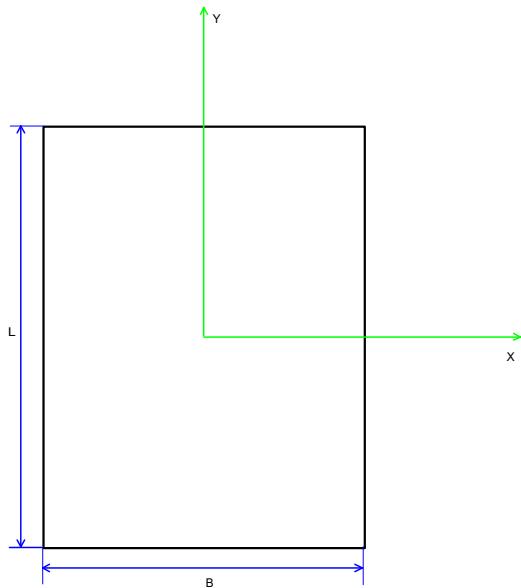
Notation for Rectangular Loaded Area Shown in Plan View
